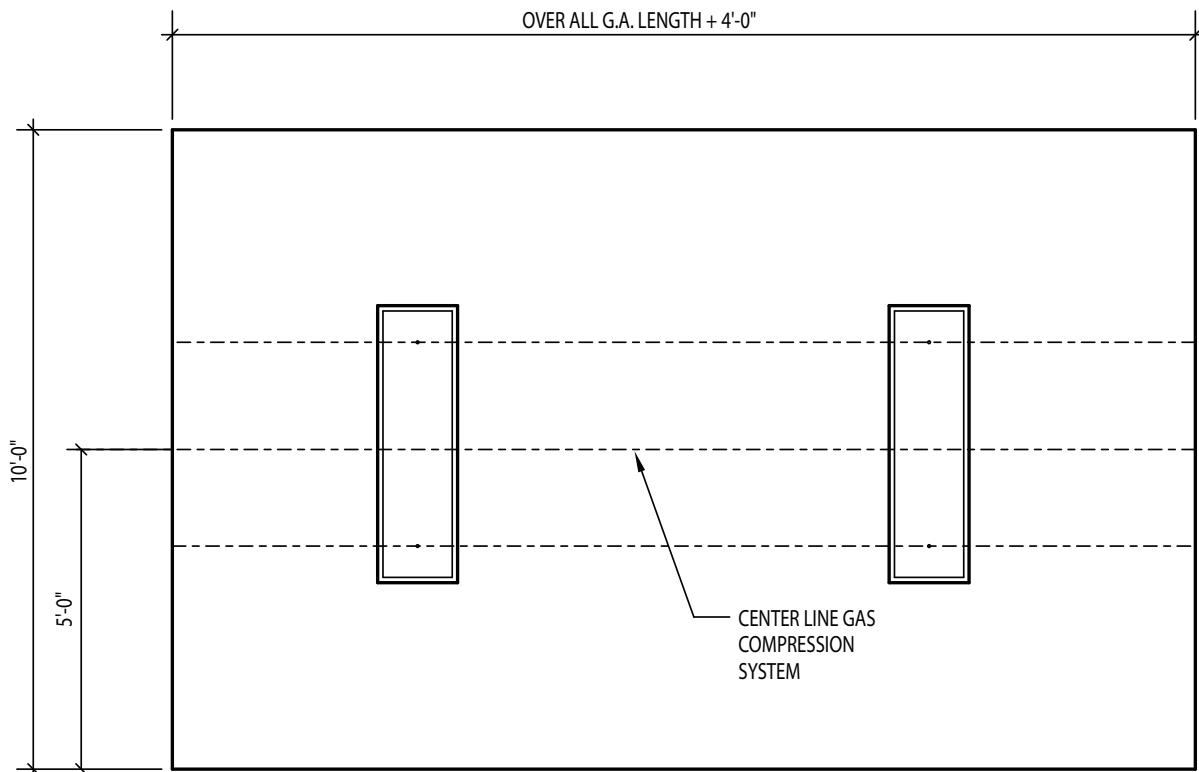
Foundation with Housekeeping Pads Dimensions - Top View
